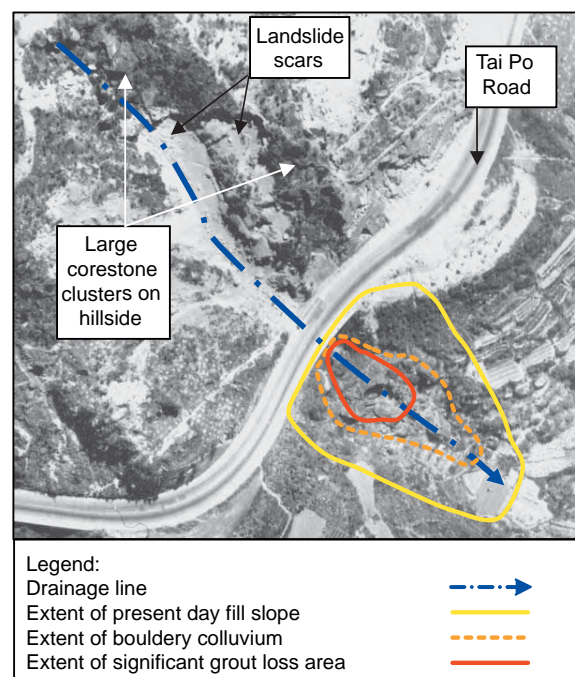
1949 aerial photograph showing the location of the fill slope below Tai Po Road prior to construction
